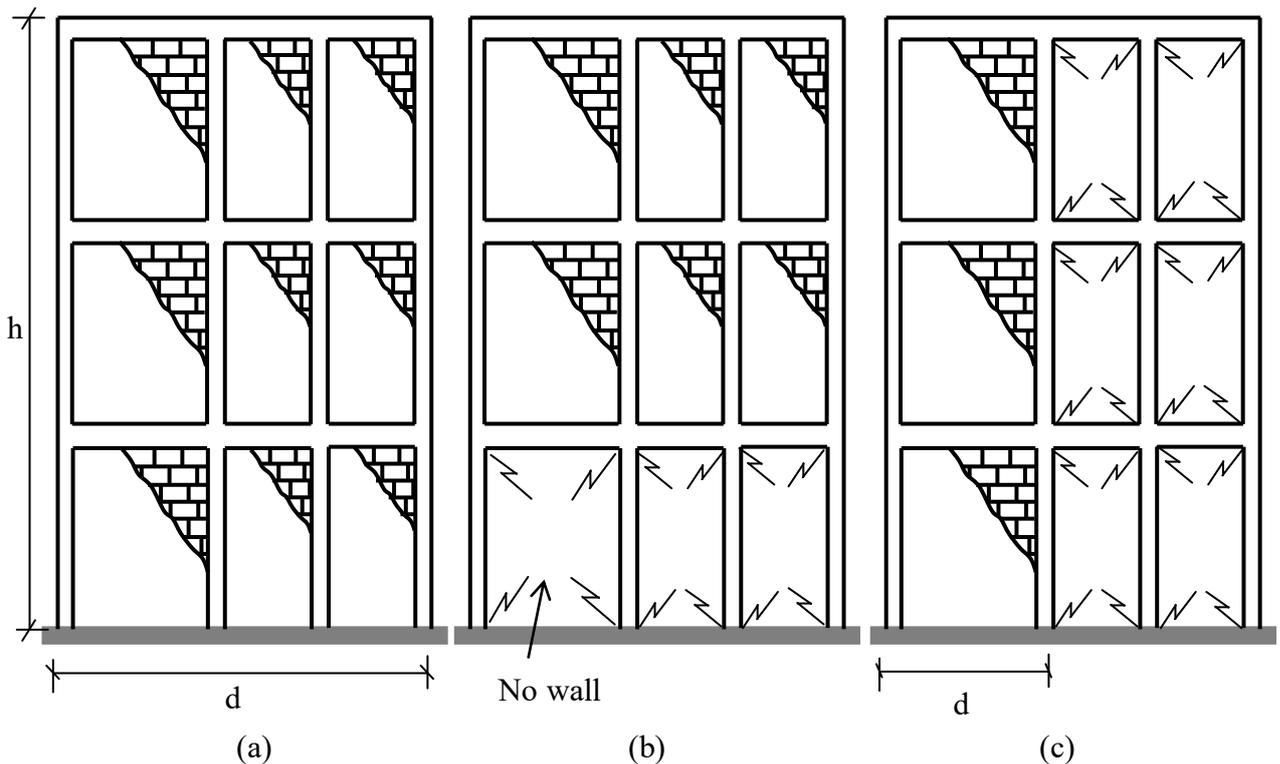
Different arrangements of masonry infill walls in RC frame
